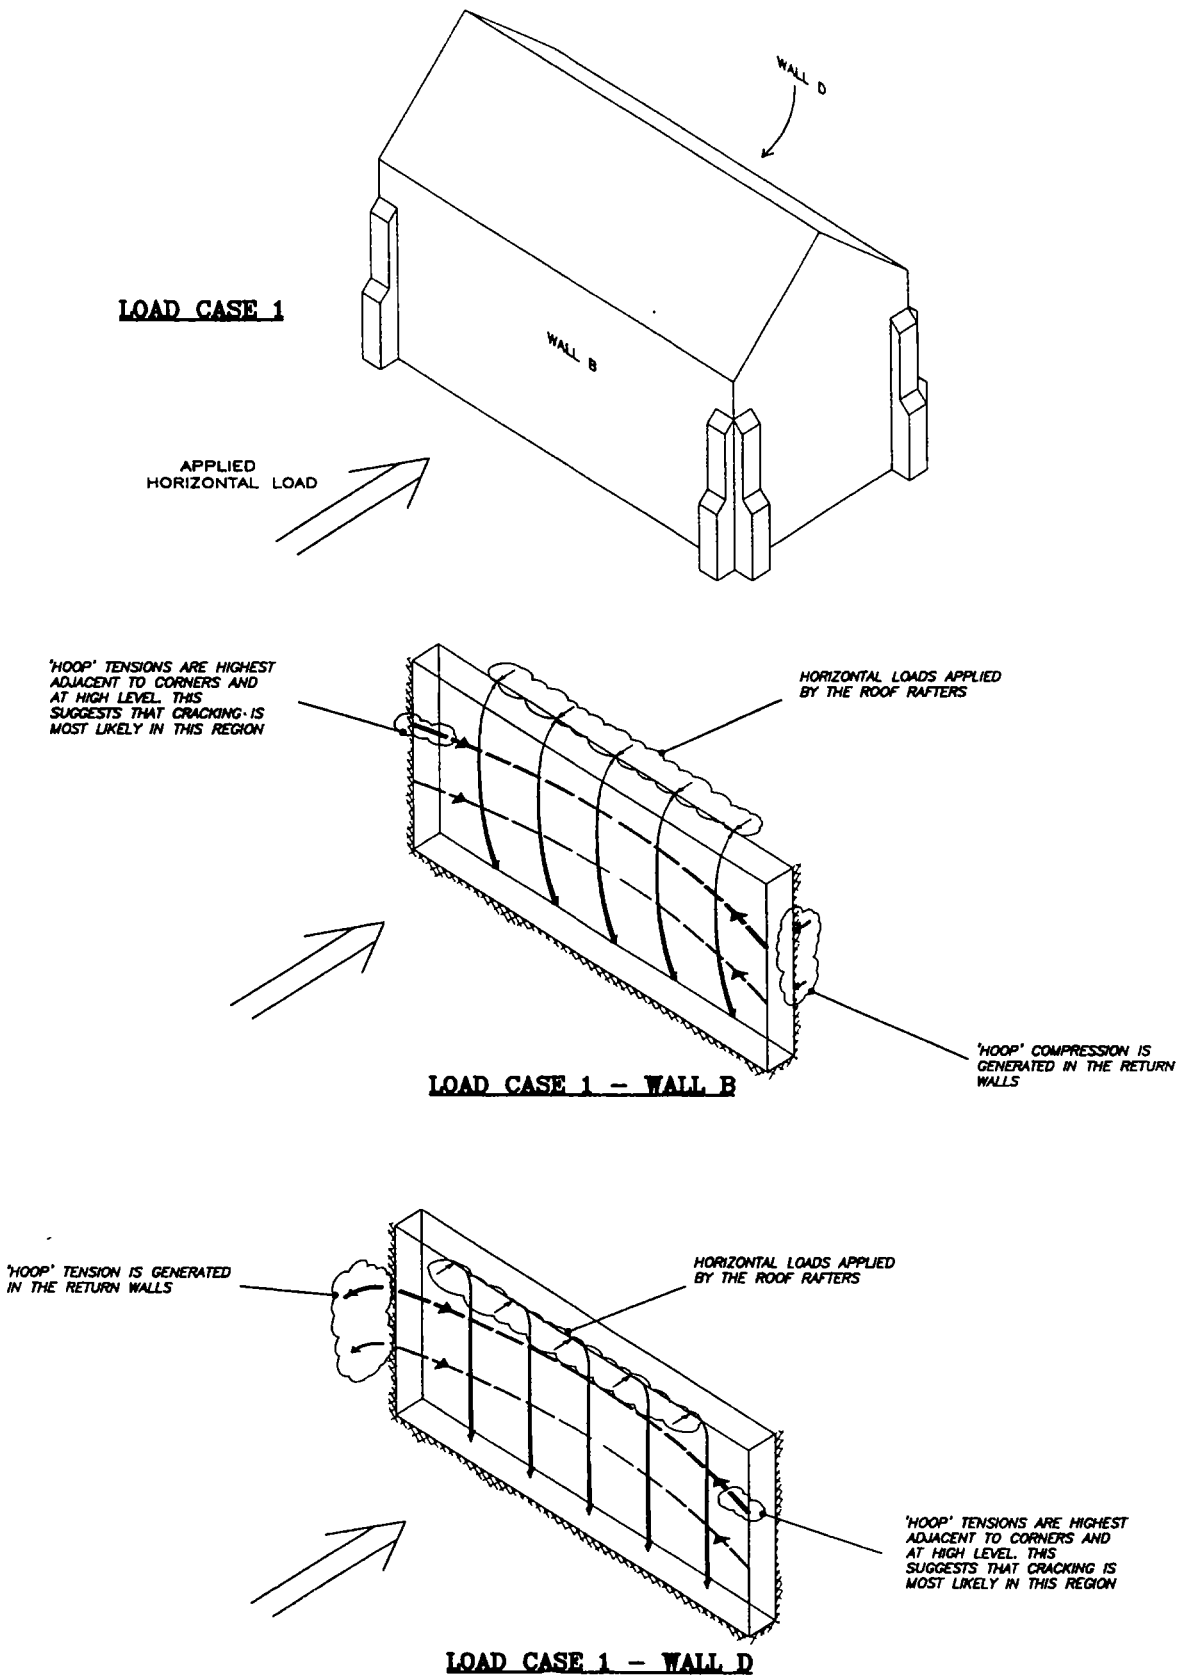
Load Case 1: Horizontal loading perpendicular to wall B
